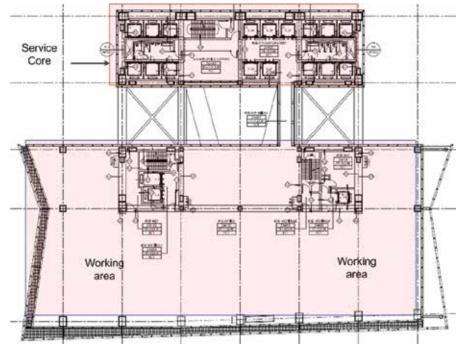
The Architetural plane (Source: China Academy of Building Research)
